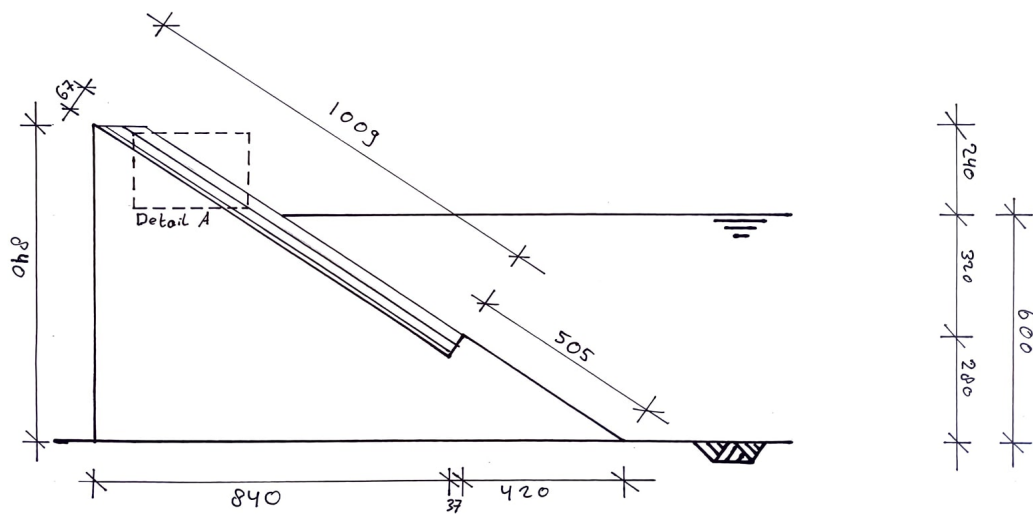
Cross-section of the breakwater test setup. Dimensions in mm.
